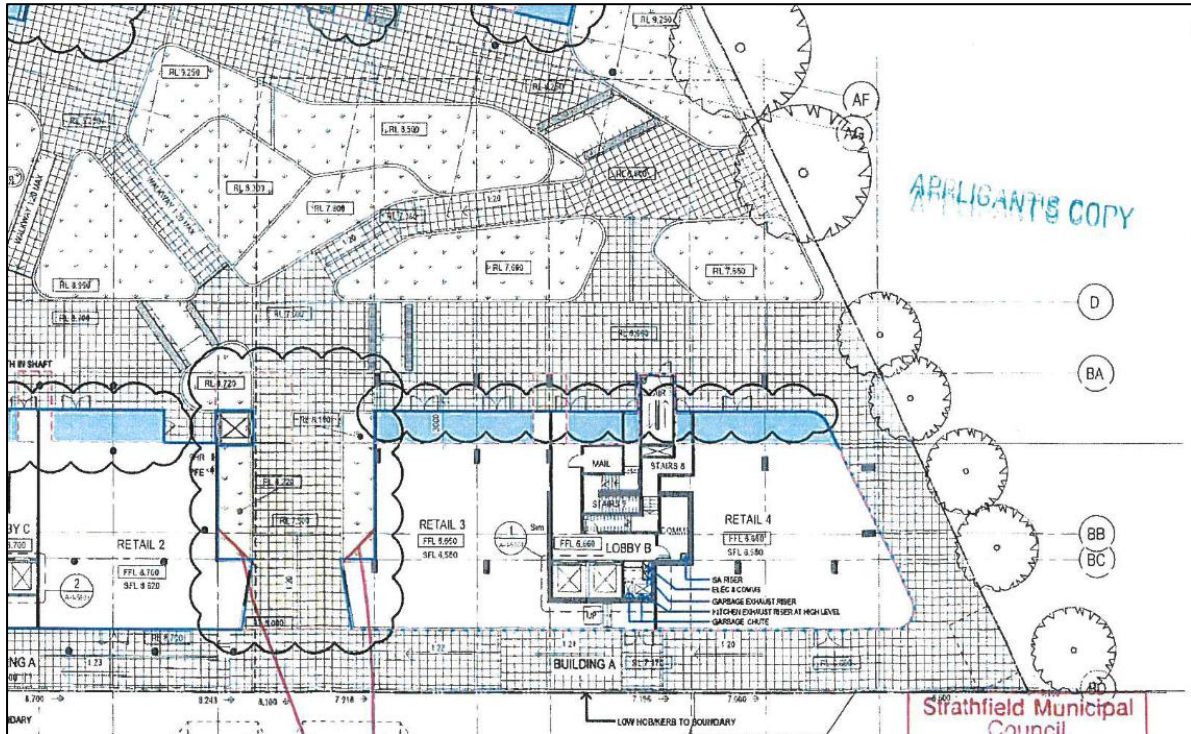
Approved landscape plan showing hardstand surfaces and some raised planter beds.
